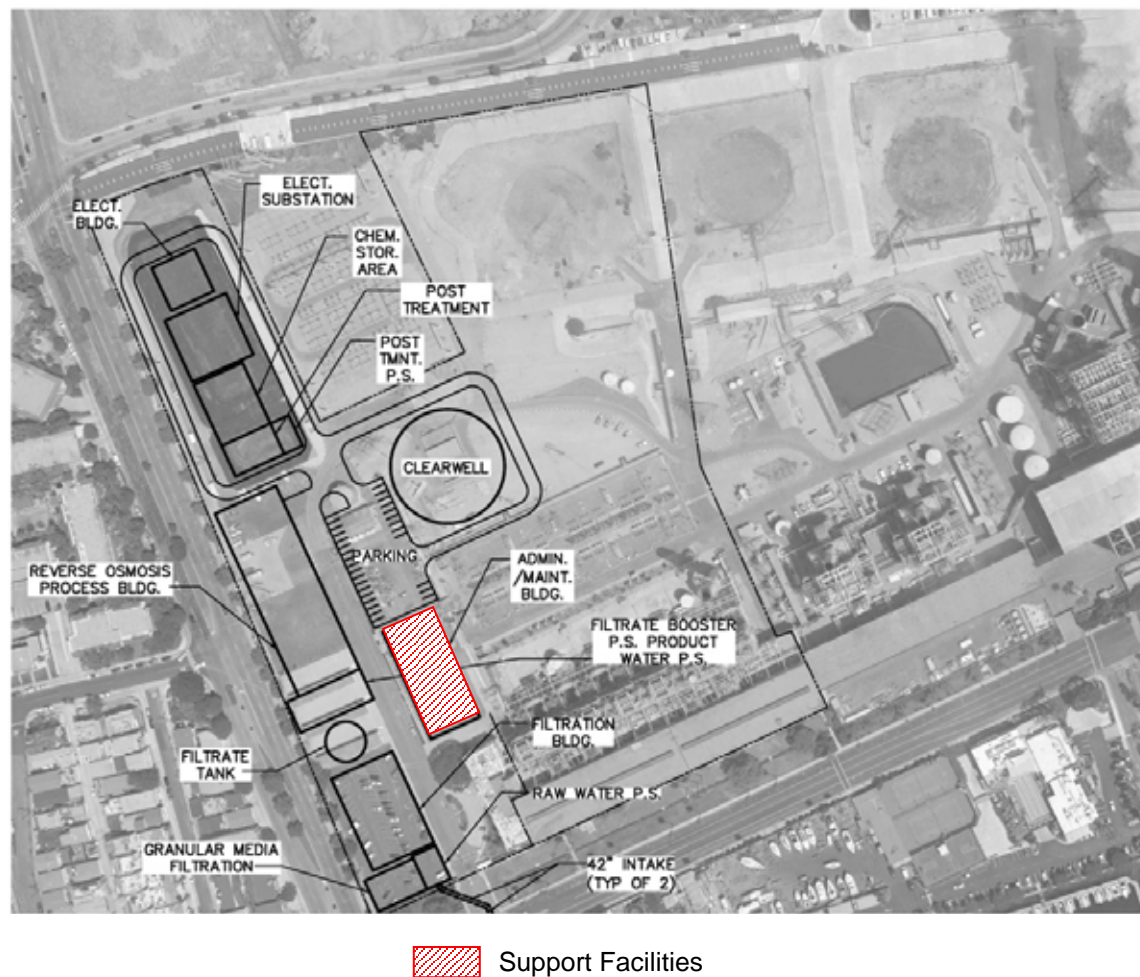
NRG Preliminary Site Layout – 60 MGD Support Facilities
